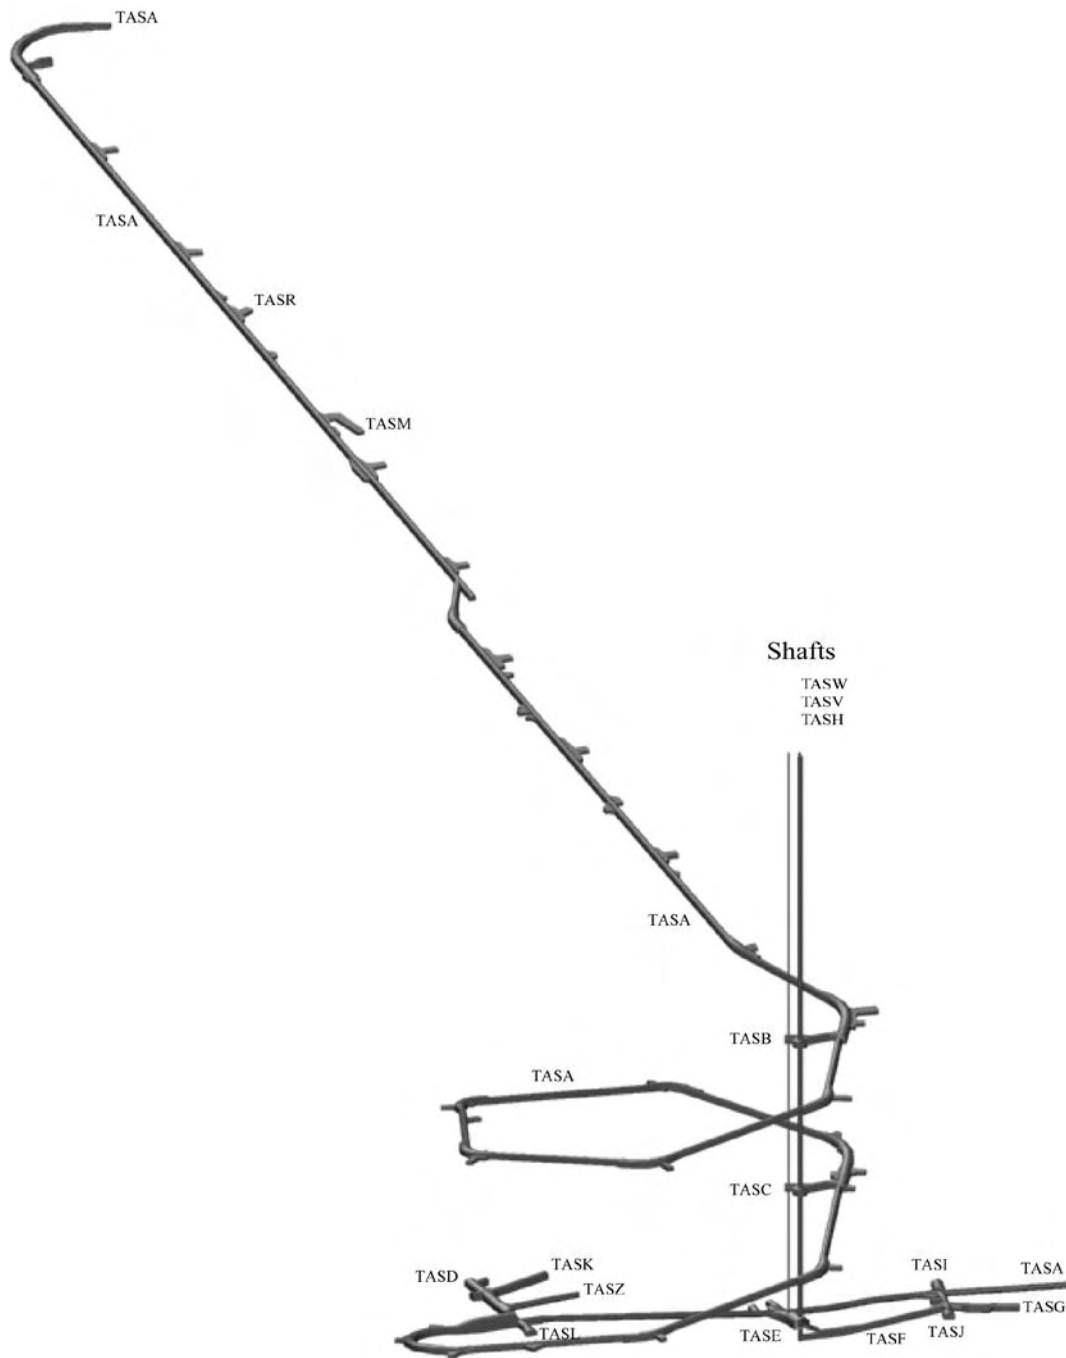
Overview of the Äspö tunnel layout, autumn 1998. (TASA is the ID code for the main tunnel A.) The tunnel is viewed from a point located NNE of Äspö Island.
